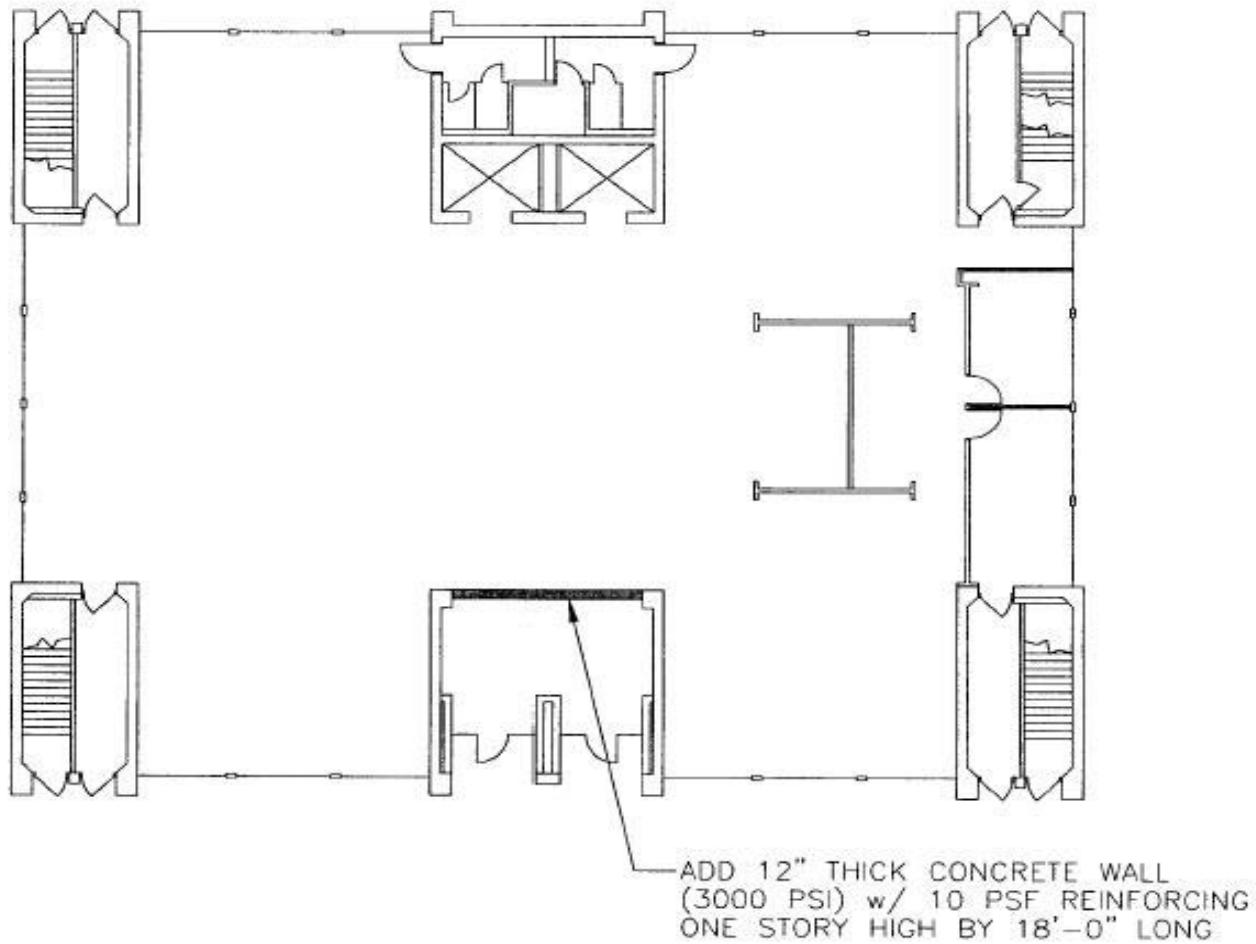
PROPOSED ADDITIONAL WALL LOCATION
